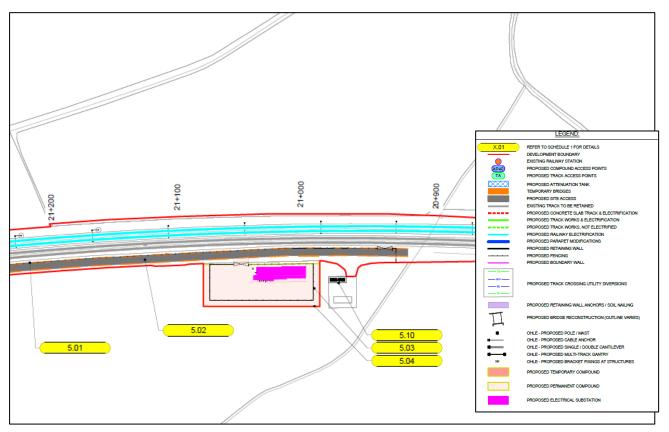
Adamstown Station – Track Plan Layout (2 of 2)
